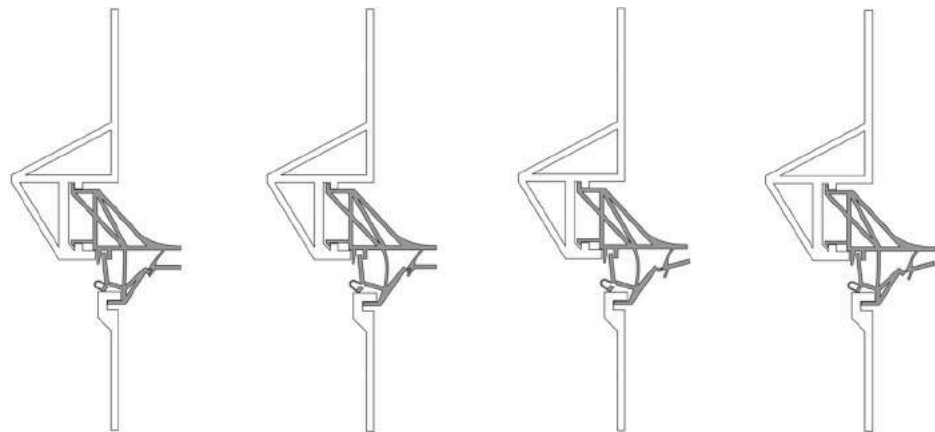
Test set up, specimen 7 & 8 - specimen 9 & 10 - specimen 11 - specimen 12 (Own)
